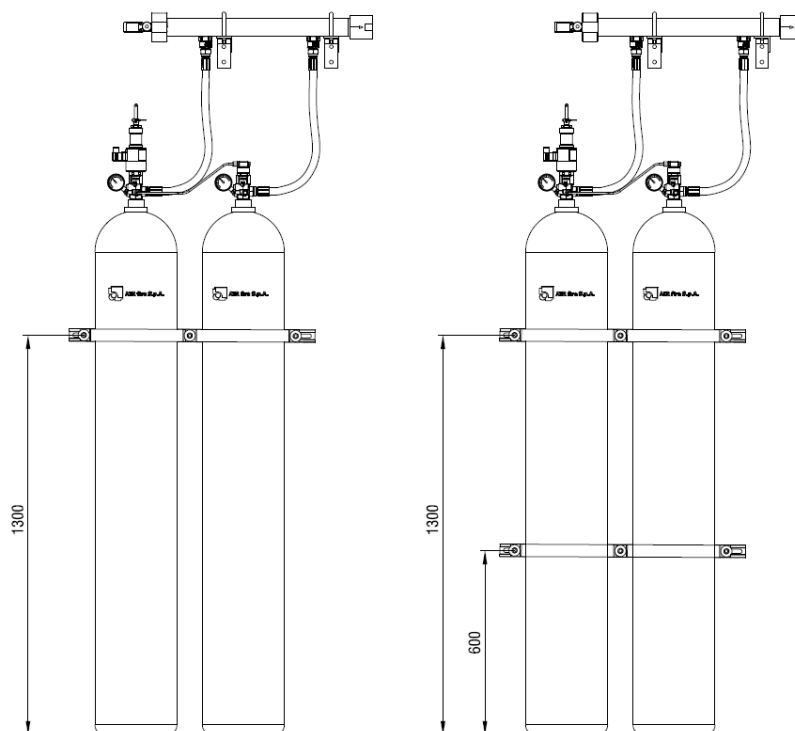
Bank cylinder single level and double level brackets, dimensions
